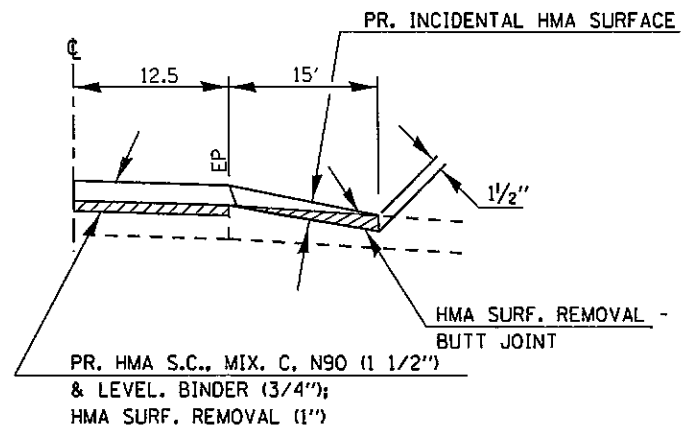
DETAIL FOR HMA SURFACE REMOVAL - BUTT JOINT
